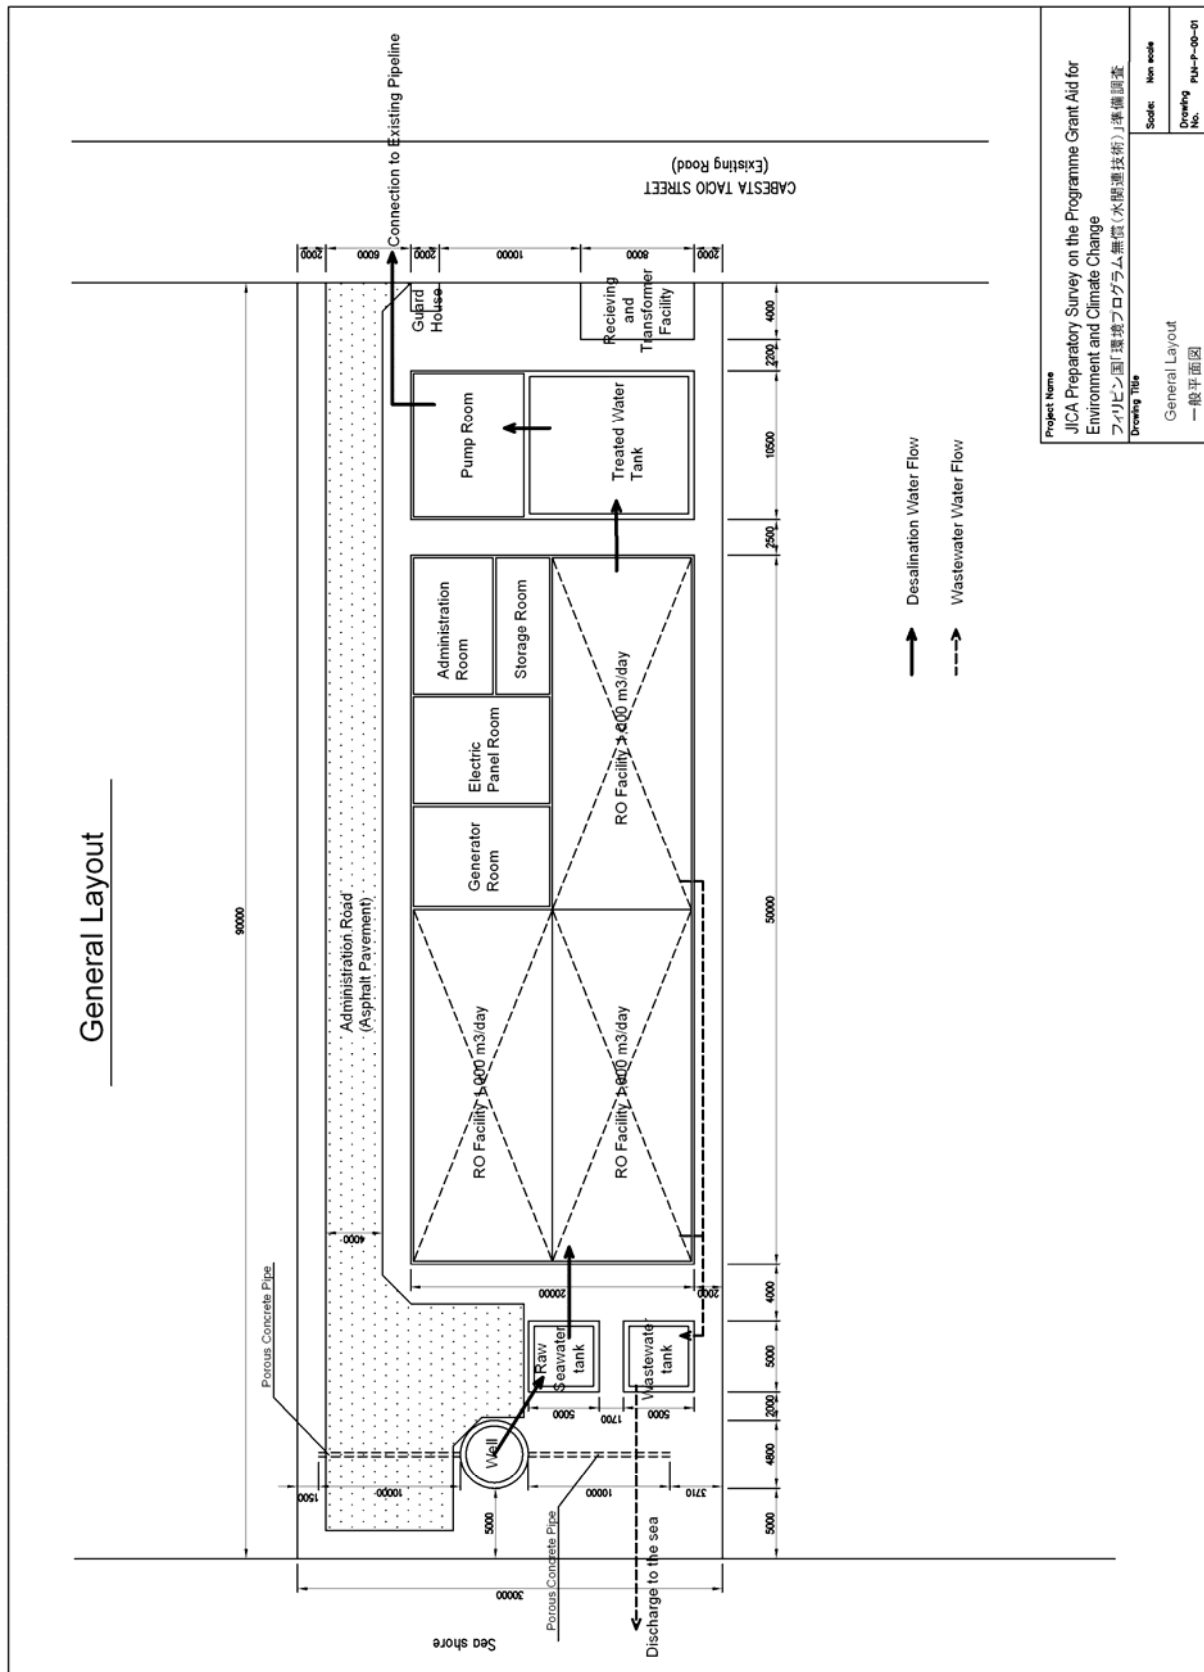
General Layout Image of Desalination Plant Plan
